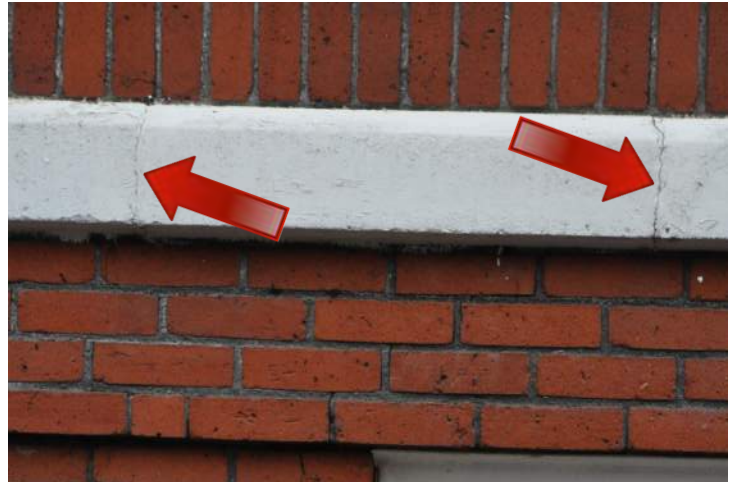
Two cracks in the precast concrete belt course are the result of the vertical cracks telegraphing through this building element. Such cracks should be repaired to prevent water intrusion into the masonry wall system that promotes deterioration.
